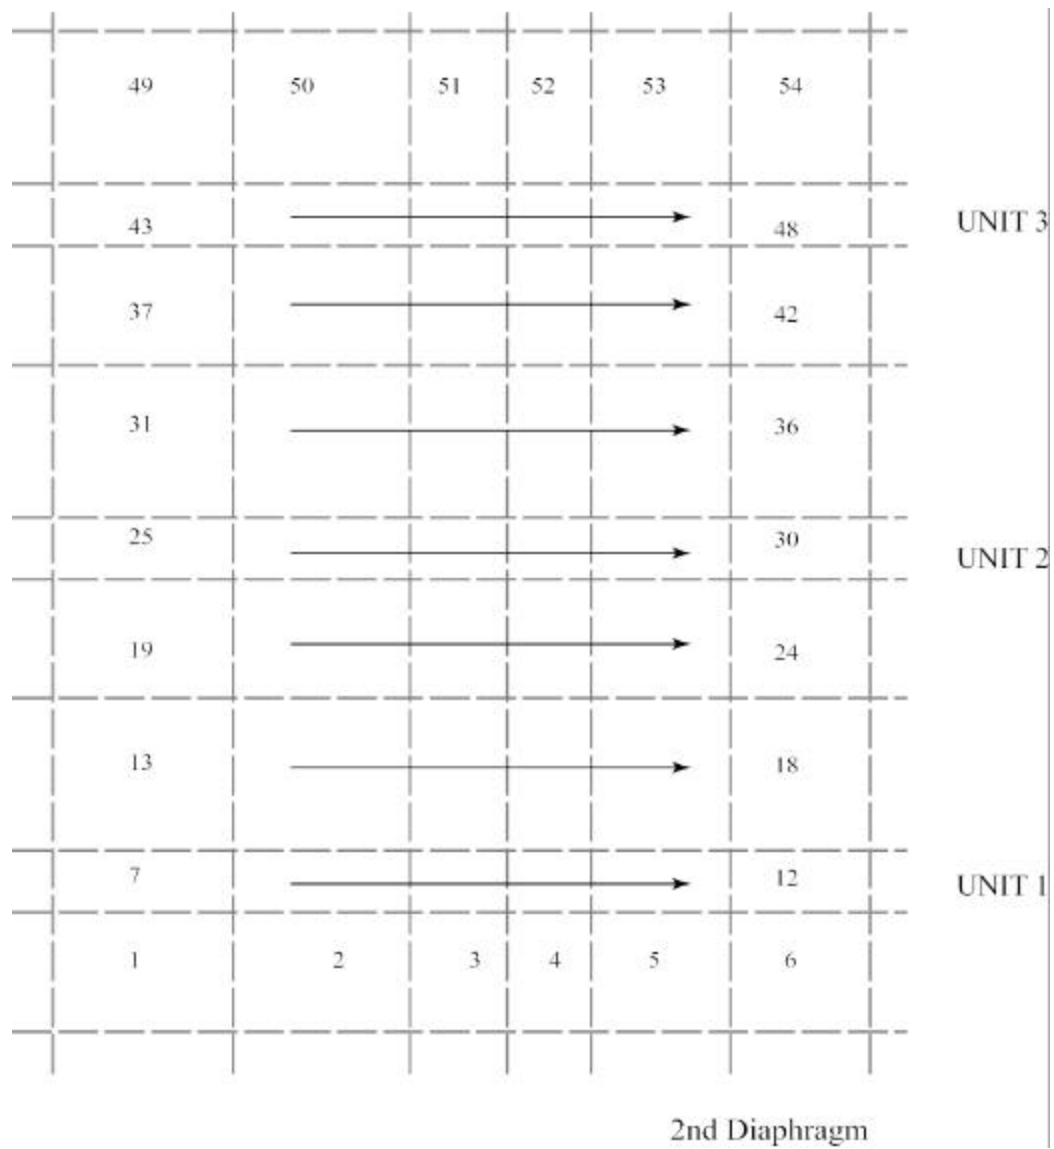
Locations, Orientation and Numbering of Quadrilateral Elements for the Second Floor Diaphragm of the Townhouse Index Building.
